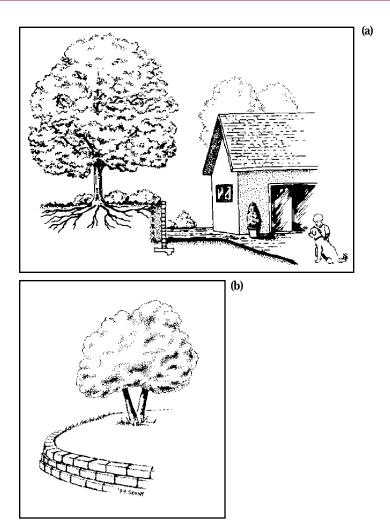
After cutting a grade near trees (a or b), build a retaining wall to prevent soil erosion.
